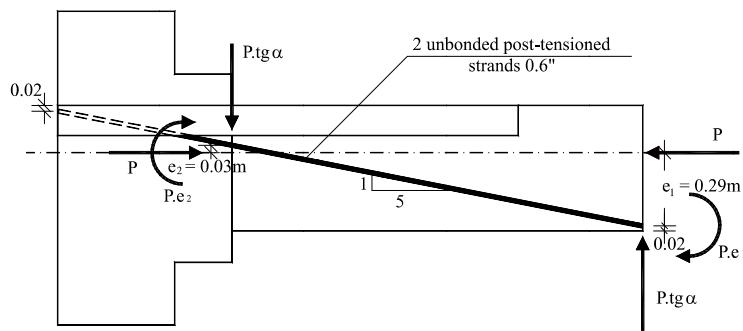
Detailing of the strengthening solution with unbonded post-tensioning system (specimen S2)
